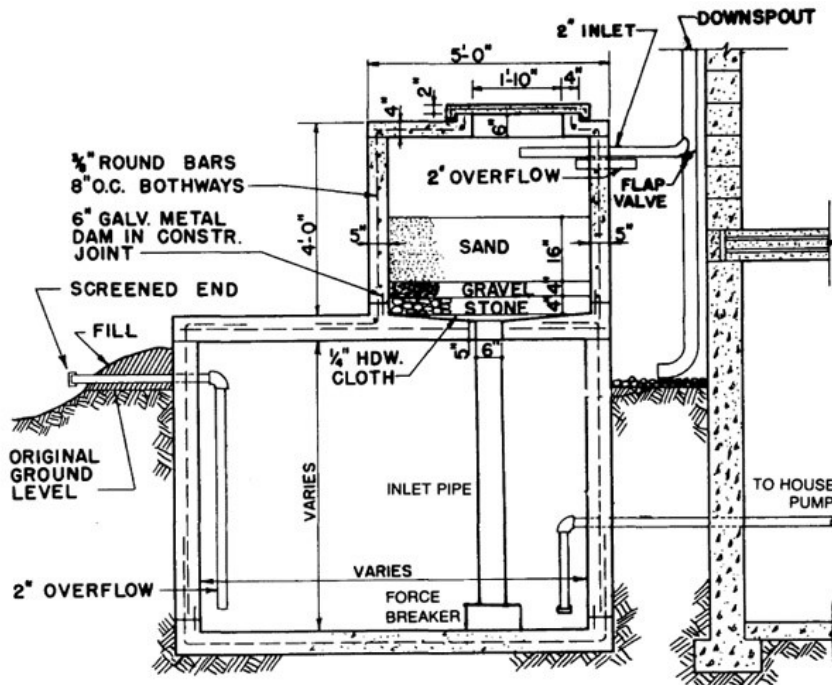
Cross section of concrete cistern with filter (Source: Penn State Ag Ext. Service, Order #800-87 Concrete Cisterns)
